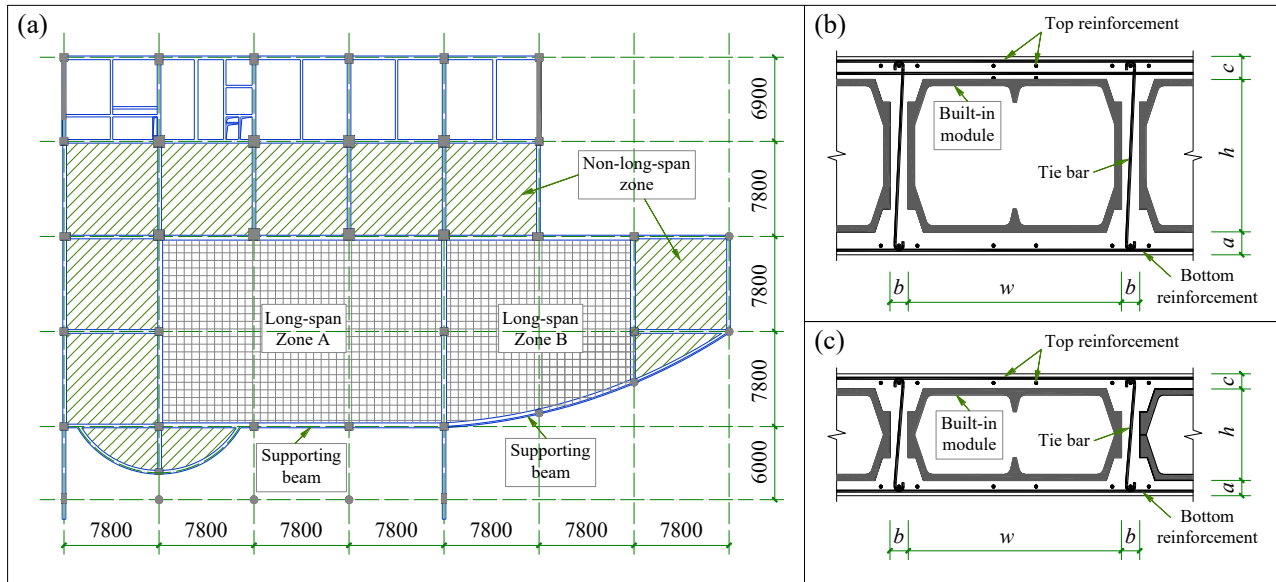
Design information of the building case: (a) Floor plan, (b) Cross-section of the long-span slab, (c) Cross-section of the non-long-span slab
